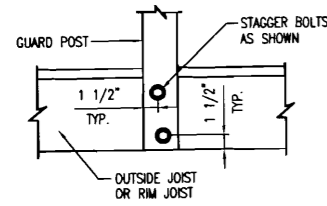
GUARD POST ATTACHMENT DETAIL
